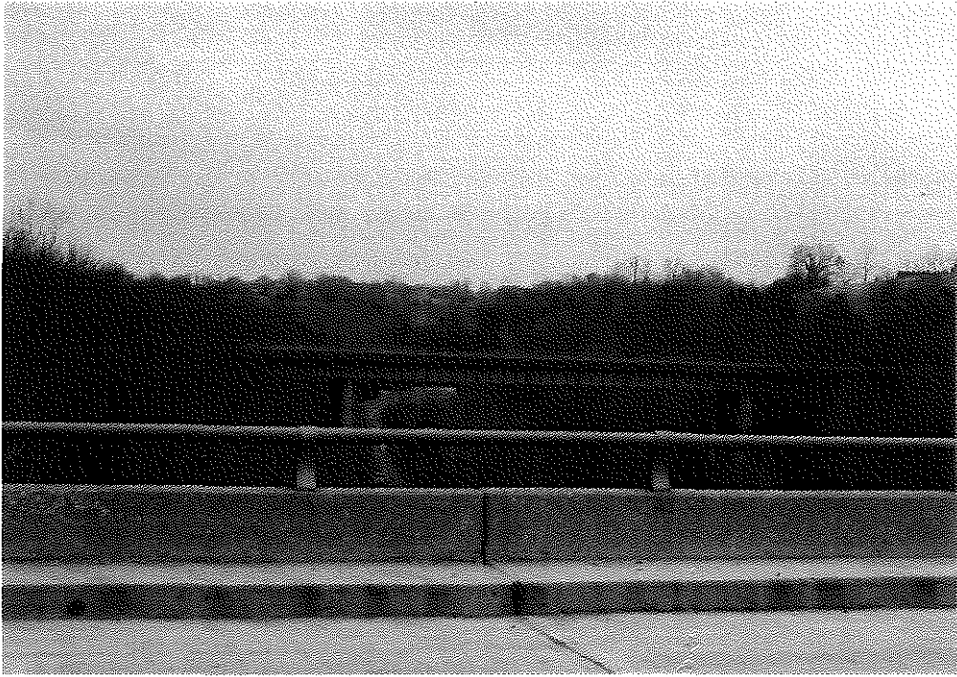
I-64 EASTBOUND OVER KY 420 SHOWING BEARING CORROSION (1997).
